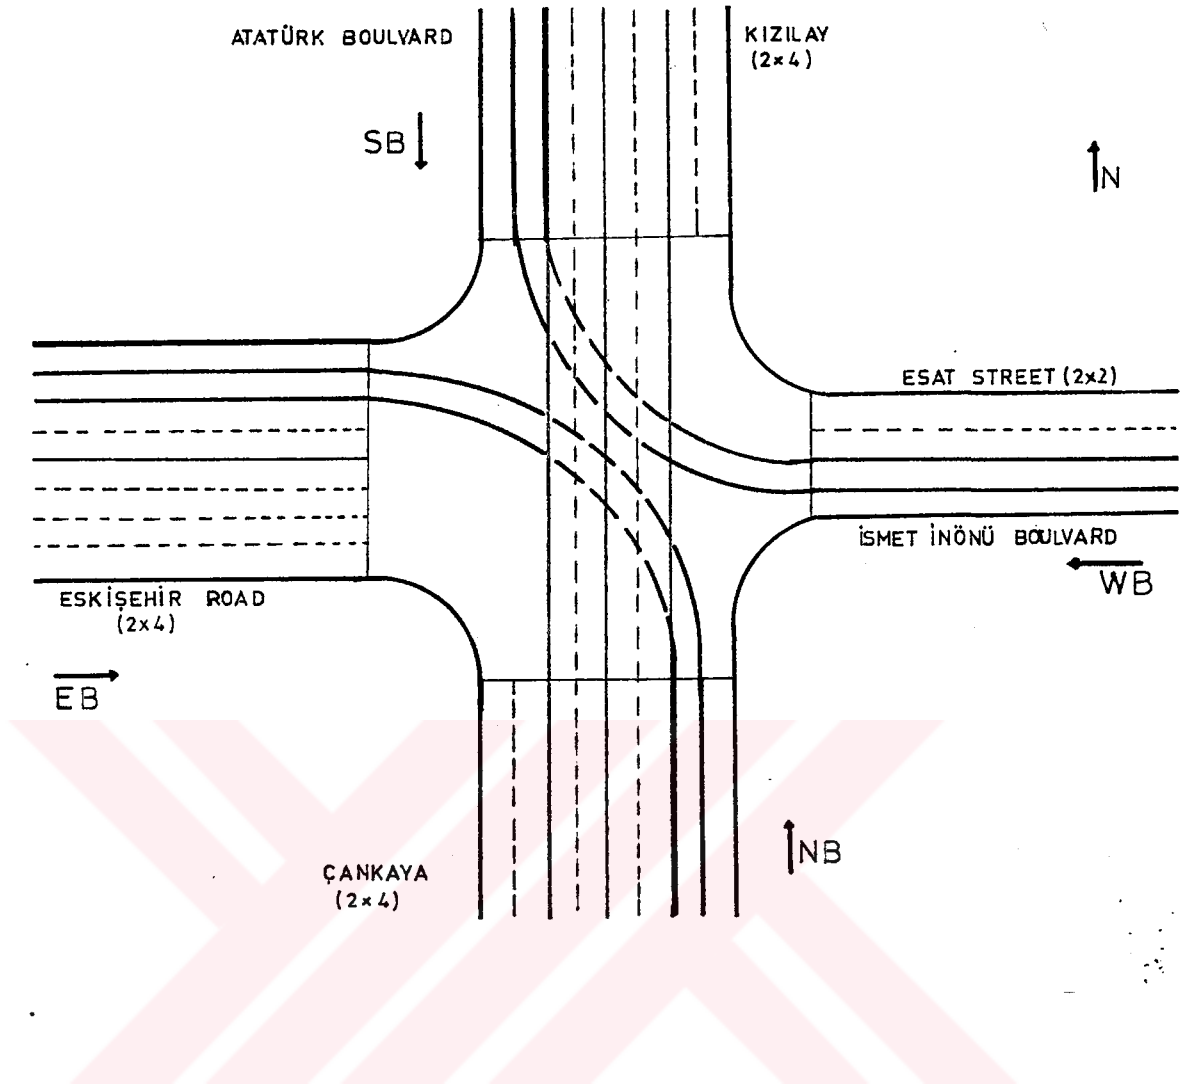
General Geometric Layout of Proposed Urban GSI.
